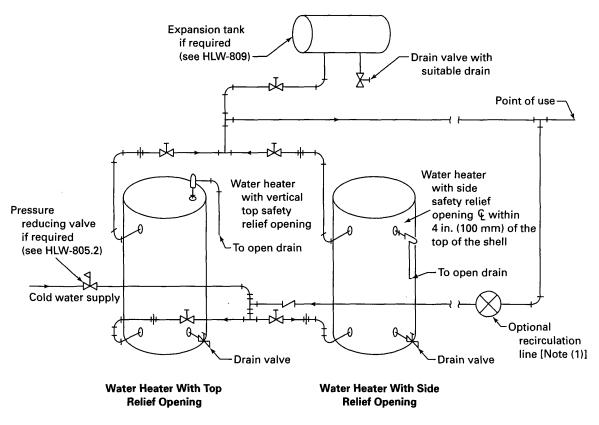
A TYPICAL ACCEPTABLE PIPING INSTALLATION FOR STORAGE WATER HEATERS IN BATTERY
